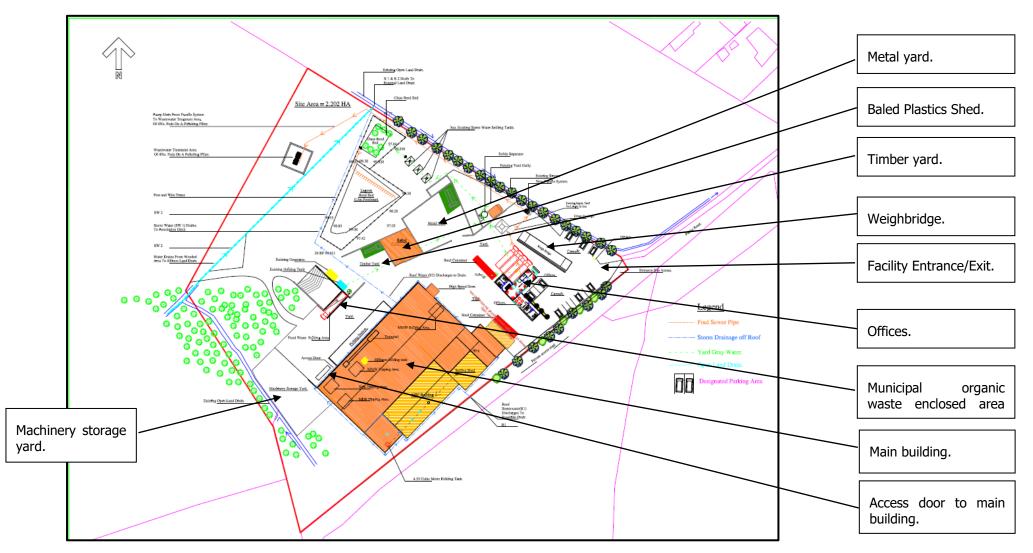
Site Layout Plan – location of emission points, generator and process effluent holding.
